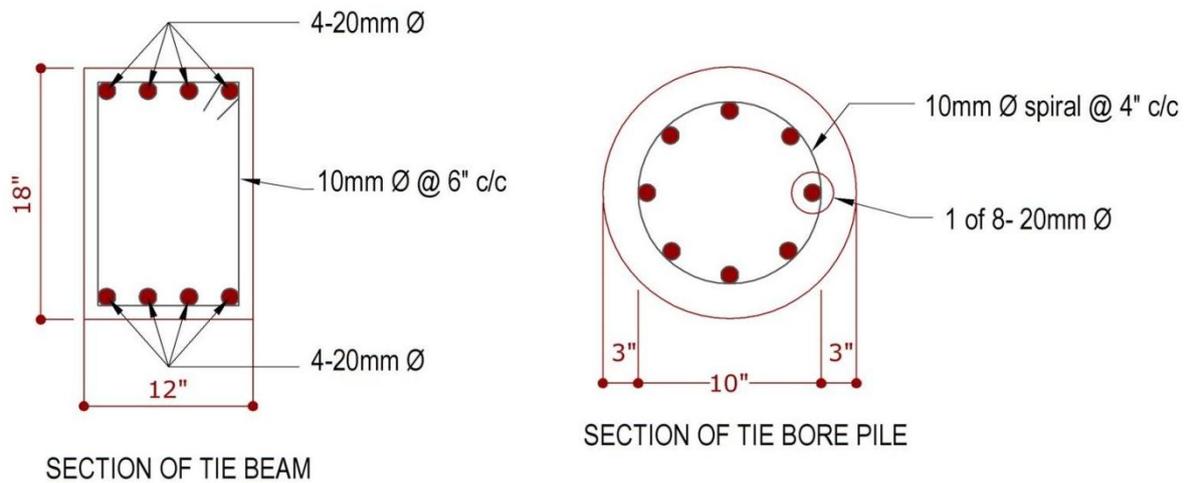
Cross Section of Bored Pile and Tie Beam Showing Reinforcement
